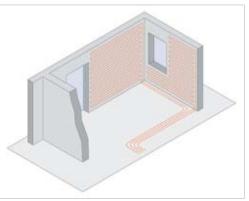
The REHAU wall heating/cooling used as full-load heating
